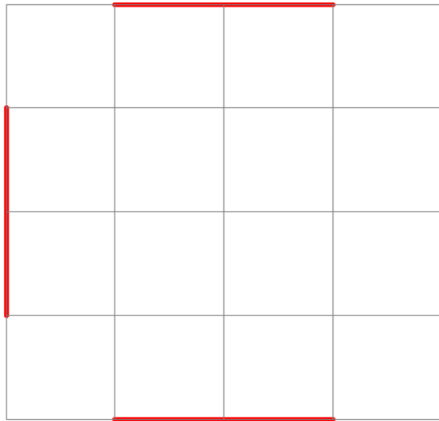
(a) Structural Plan for V-braced RC Frame (Model-6)
